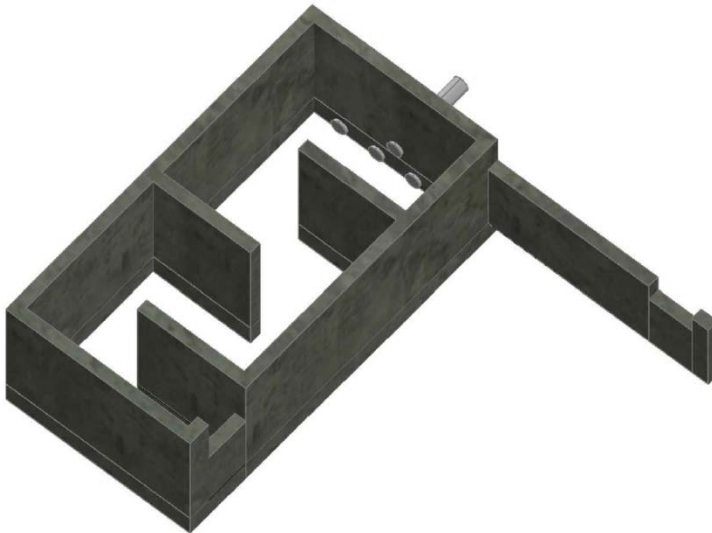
A 3D model of new intake structure. (Note: A concrete floor 4" thick will be built for the intake structure)
